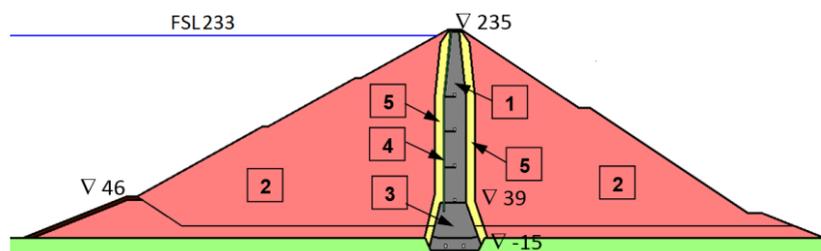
Scheme of arrangement of concrete face rockfill dam 1 – concrete face made of roller compacted concrete, 2 – rockfill shells, 3 – concrete face foundation made of vibrated concrete, 4 – asphalt concrete face, 5 – transition zones.
